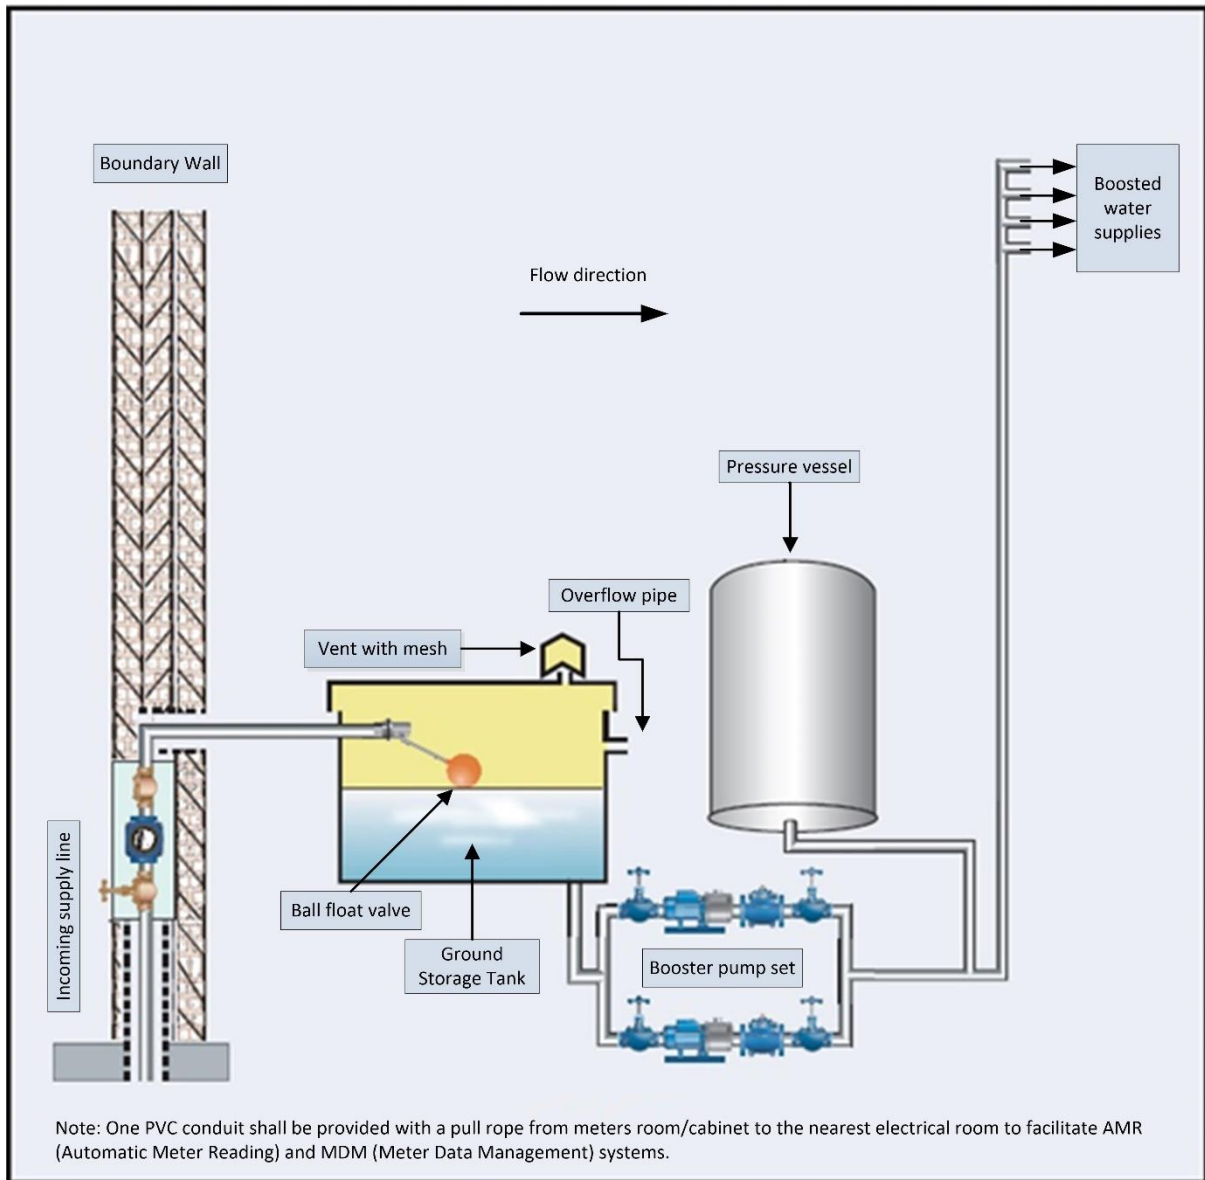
A typical connection arrangement for applications such as hotels and hospitals
